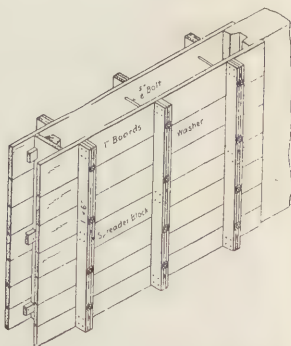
Form for continuing wall lengthwise with notch in completed part to make a bond with newly deposited concrete.
